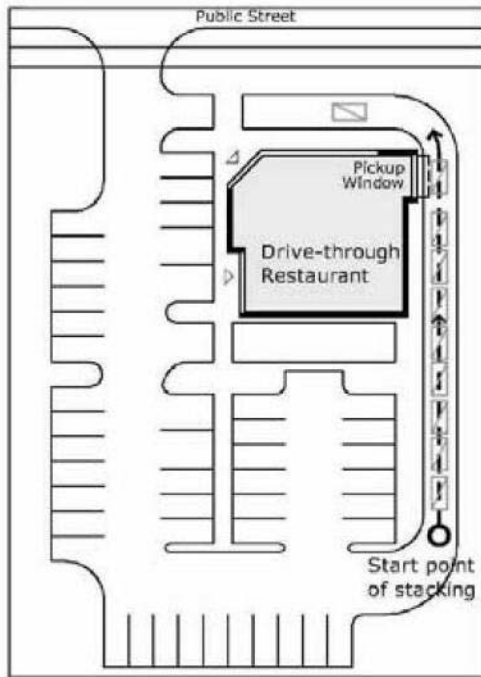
Stacking lane starts toward the rear of the site to provide adequate queuing distance; landscaping along the street frontage will screen headlight glare onto the abutting street. A single consolidated access point reduces the number of driveways along the abutting street.
